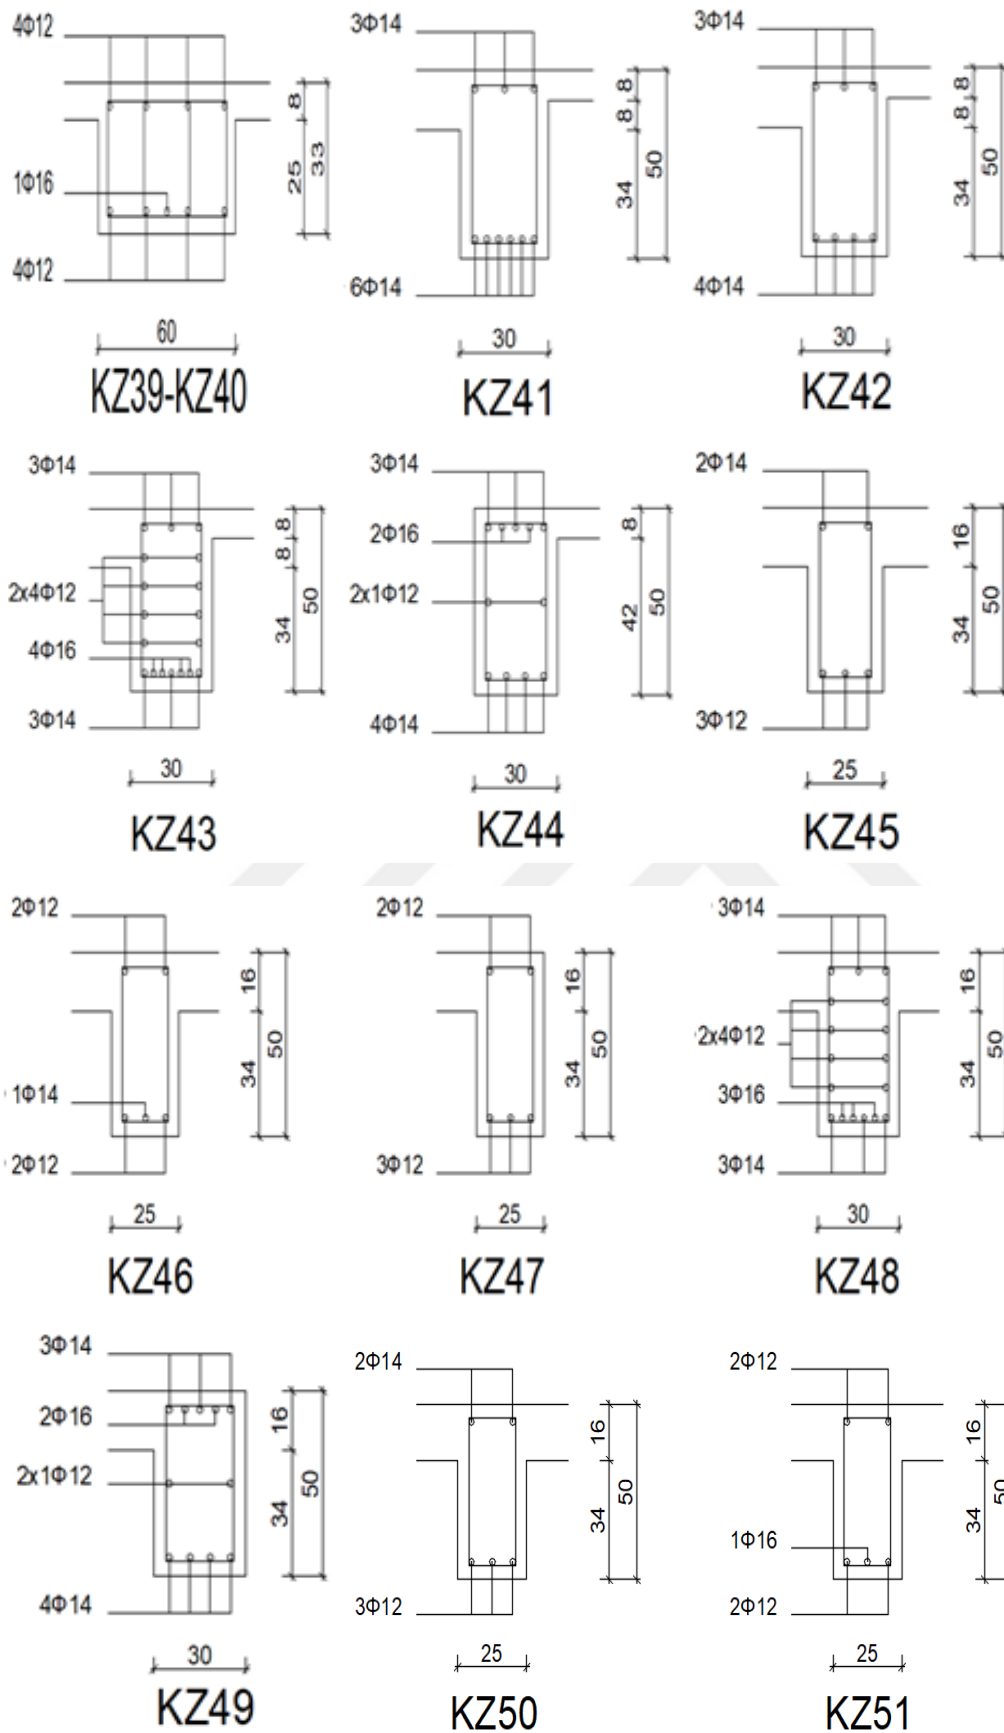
Reinforcement details of beam sections (KZ39-KZ51).
